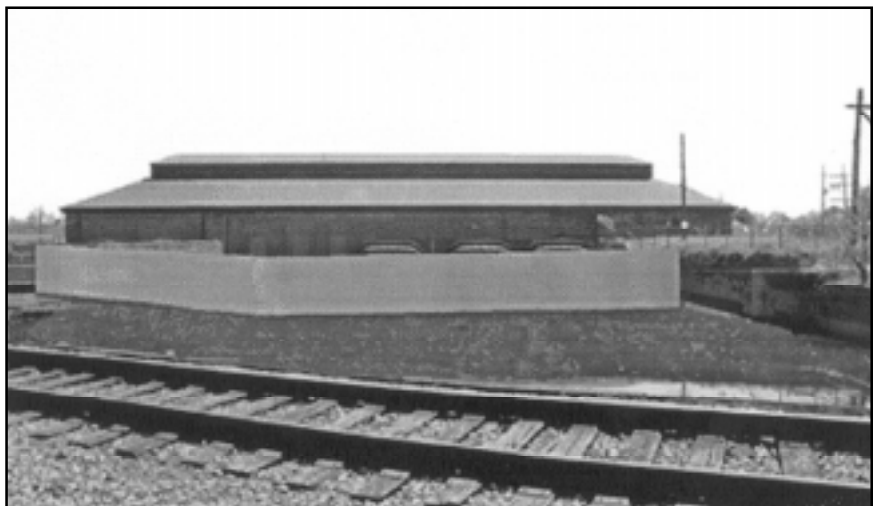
Drainage Pumping Station No. 3. View after construction of proposed improvements.
